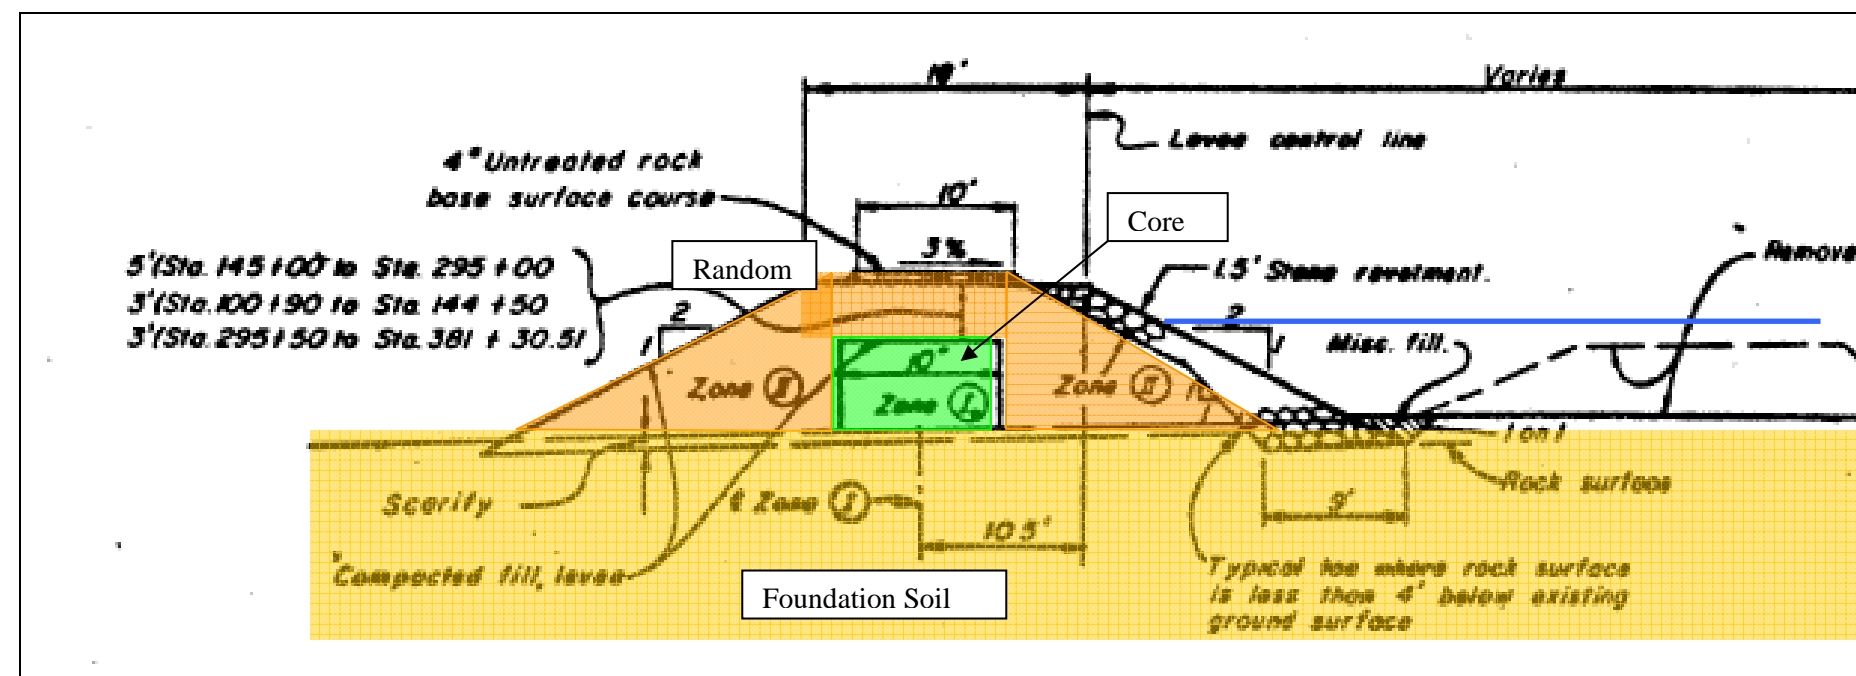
RWDL 495 Supported on Soil Foundation (RWDL Asbuilts, 1971)
